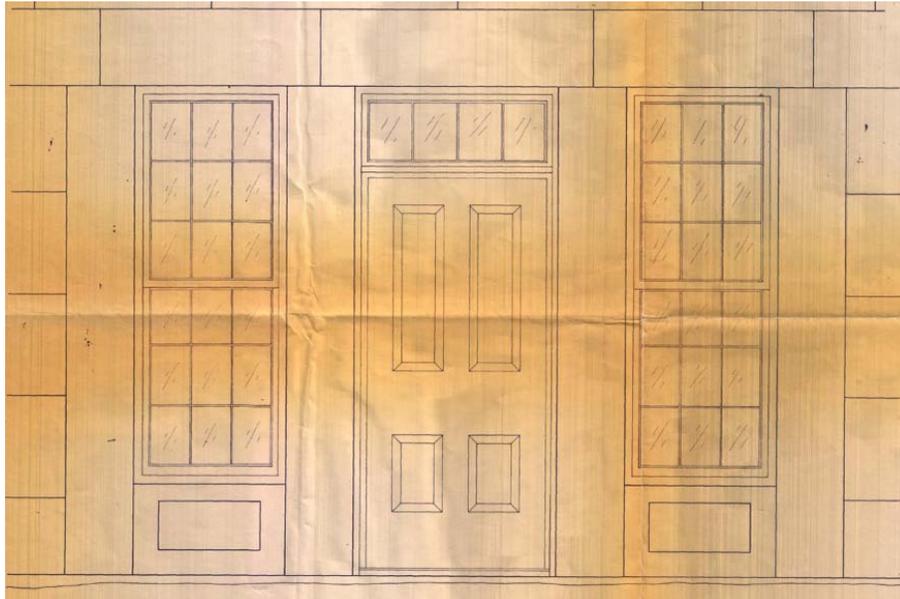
Drawings of door and window elevations from the New Bedford City Planning Department in January, 1975. The original door had a glass transom above it.
